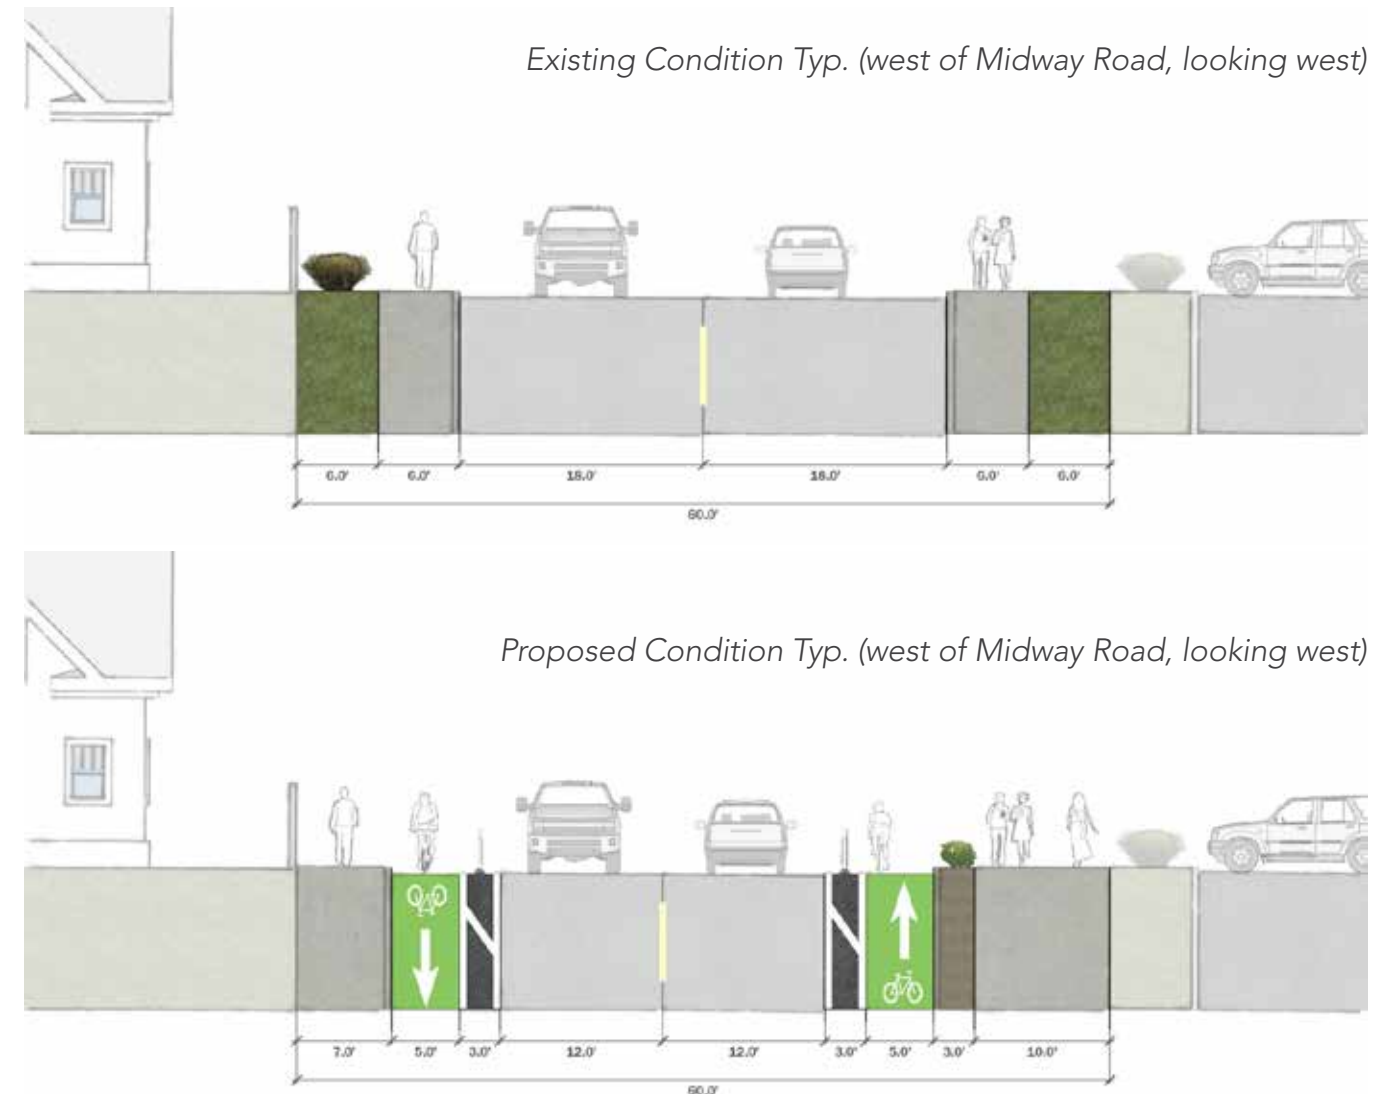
Beltway Drive Bike Lanes and Wide Sidewalk
